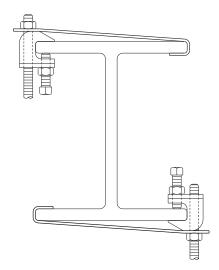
R - Retrofit Capable Beam Clamp Retaining Strap
